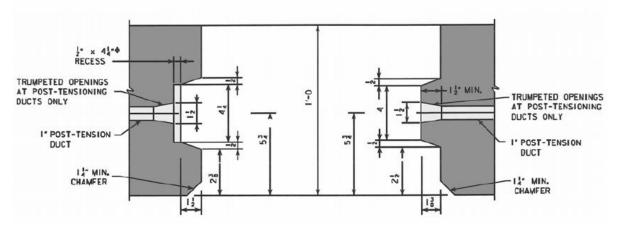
Transverse joint detail (Merritt et.al, 2007)
